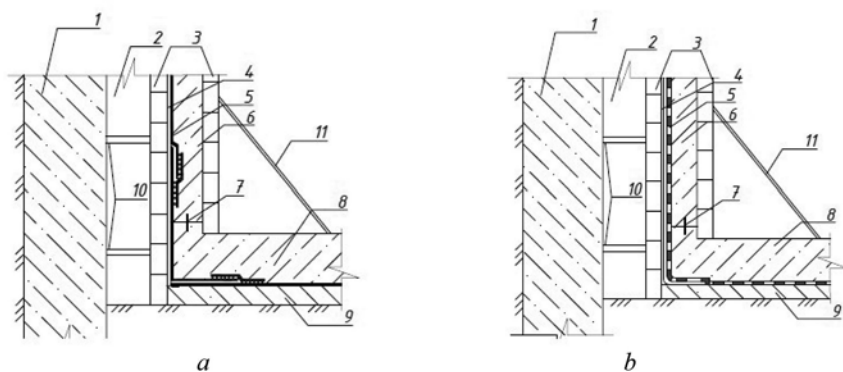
Waterproofing of structures with backfill cavities: a – factory-assembled roll-fed waterproofing coating, b – sprayed waterproofing coating; 1 – excavation protection; 2 – cavities; 3 – external and internal shuttering boards; 4 – geotextile fabric substrate; 5 – waterproofing coating; 6 – monolithic wall structure; 7 – water stop; 8 – buckle plate; 9 – foundation mattress; 10 – telescopic spindles; 11 – frame for single-sided concreting.
